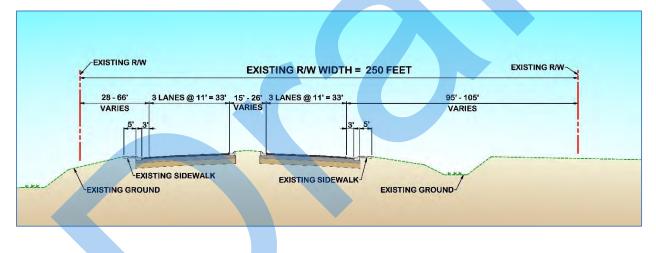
Existing SW 10<sup>th</sup> Street Typical Section - Military Trail to East Newport Center Drive
